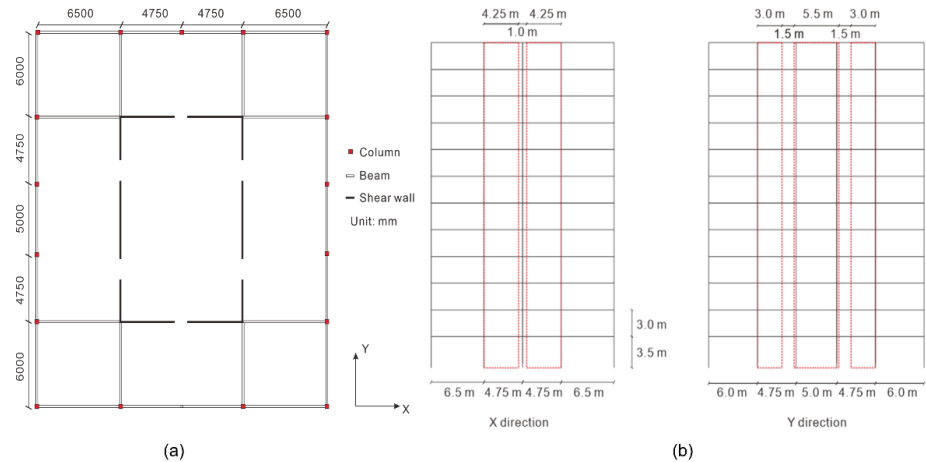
Layout of the building: (a) plan view and (b) elevation view.
